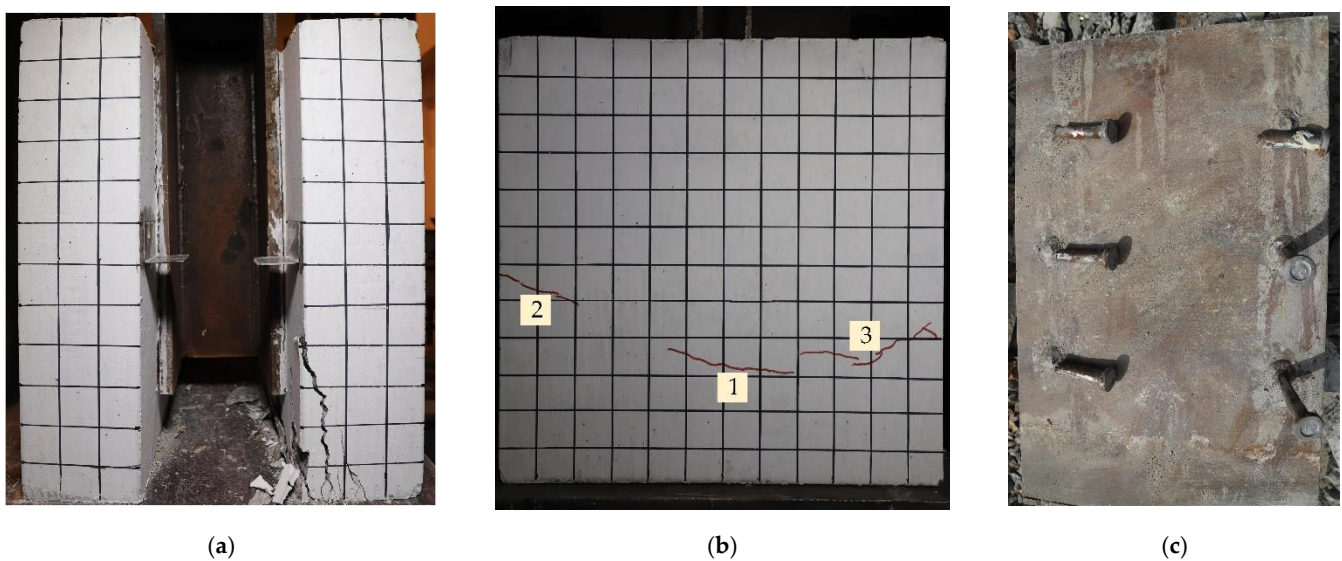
Failure modes of welded stud shear connector: (a) front of concrete slab; (b) side of concrete slab; (c) perforated steel plate.
